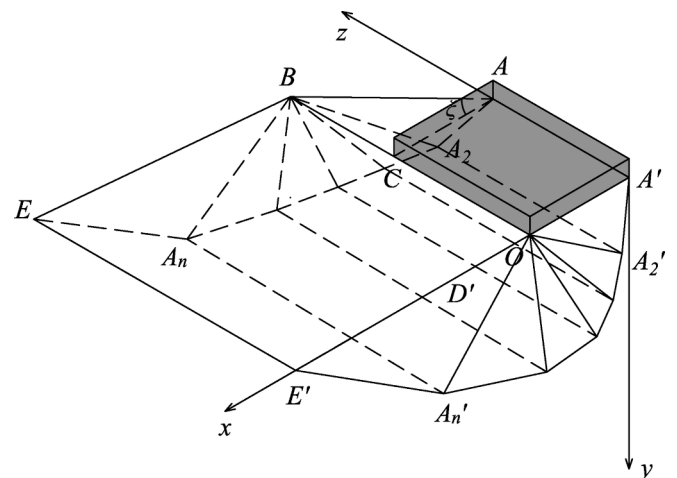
The failure mechanism of a rectangular foundation when it is far enough from the slope.
